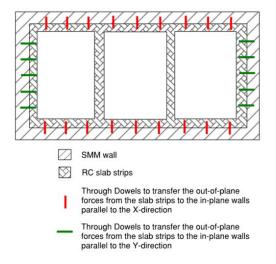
The red and green lines indicate dowels spaced at 600mm that connects the slab strip to the walls
